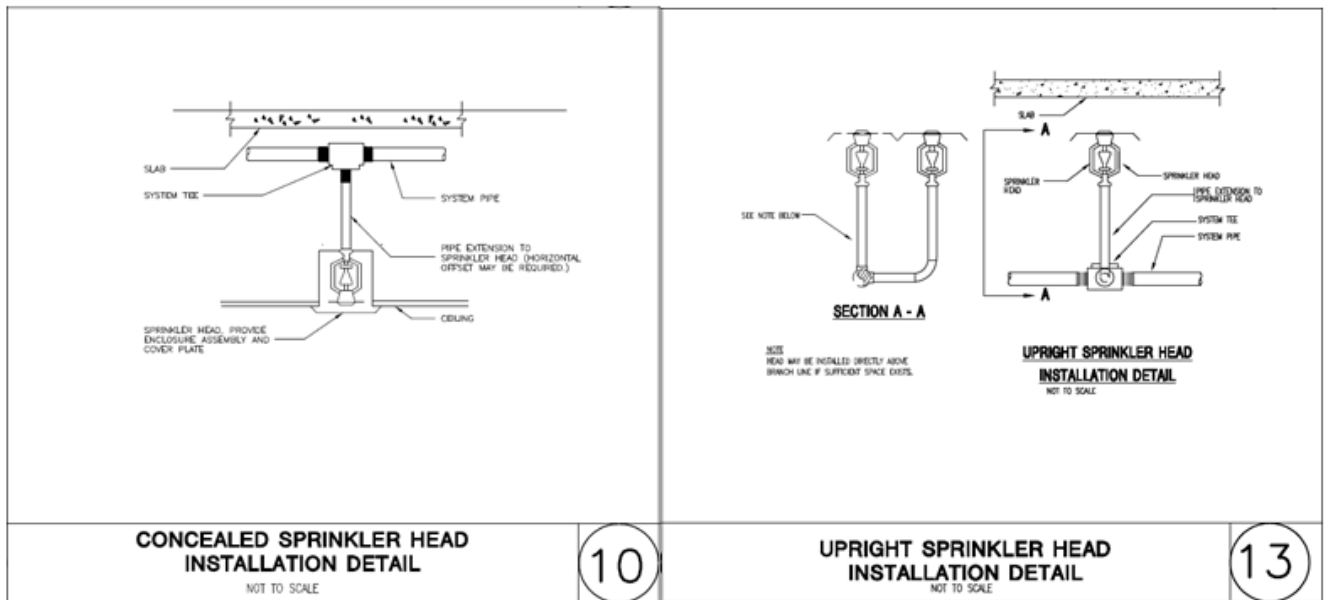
Details 10 & 13 show the required sprinkler head concealment and installation
